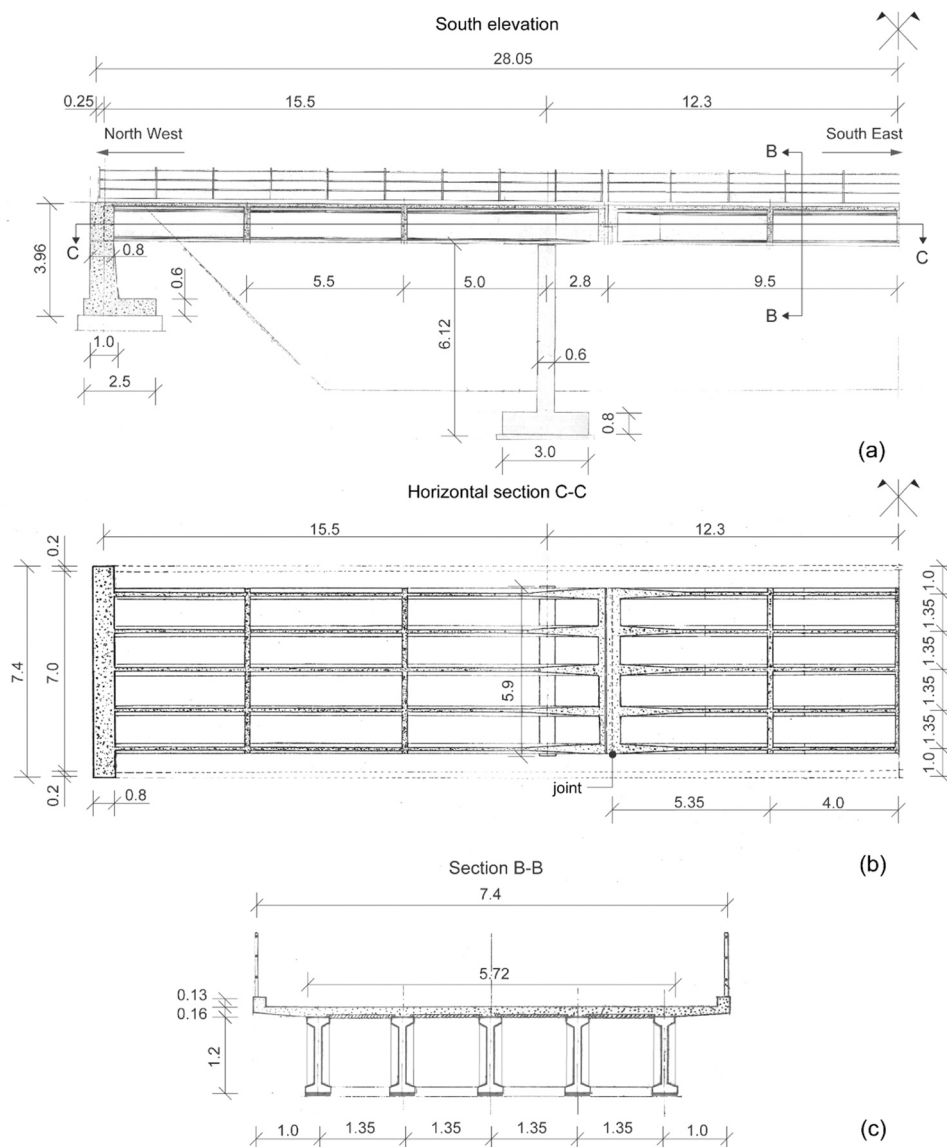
Readjustment of the original design drawings of the bridge: (a) side view, (b) horizontal section and (c) vertical cross-section (units: m; adapted from [25]).
